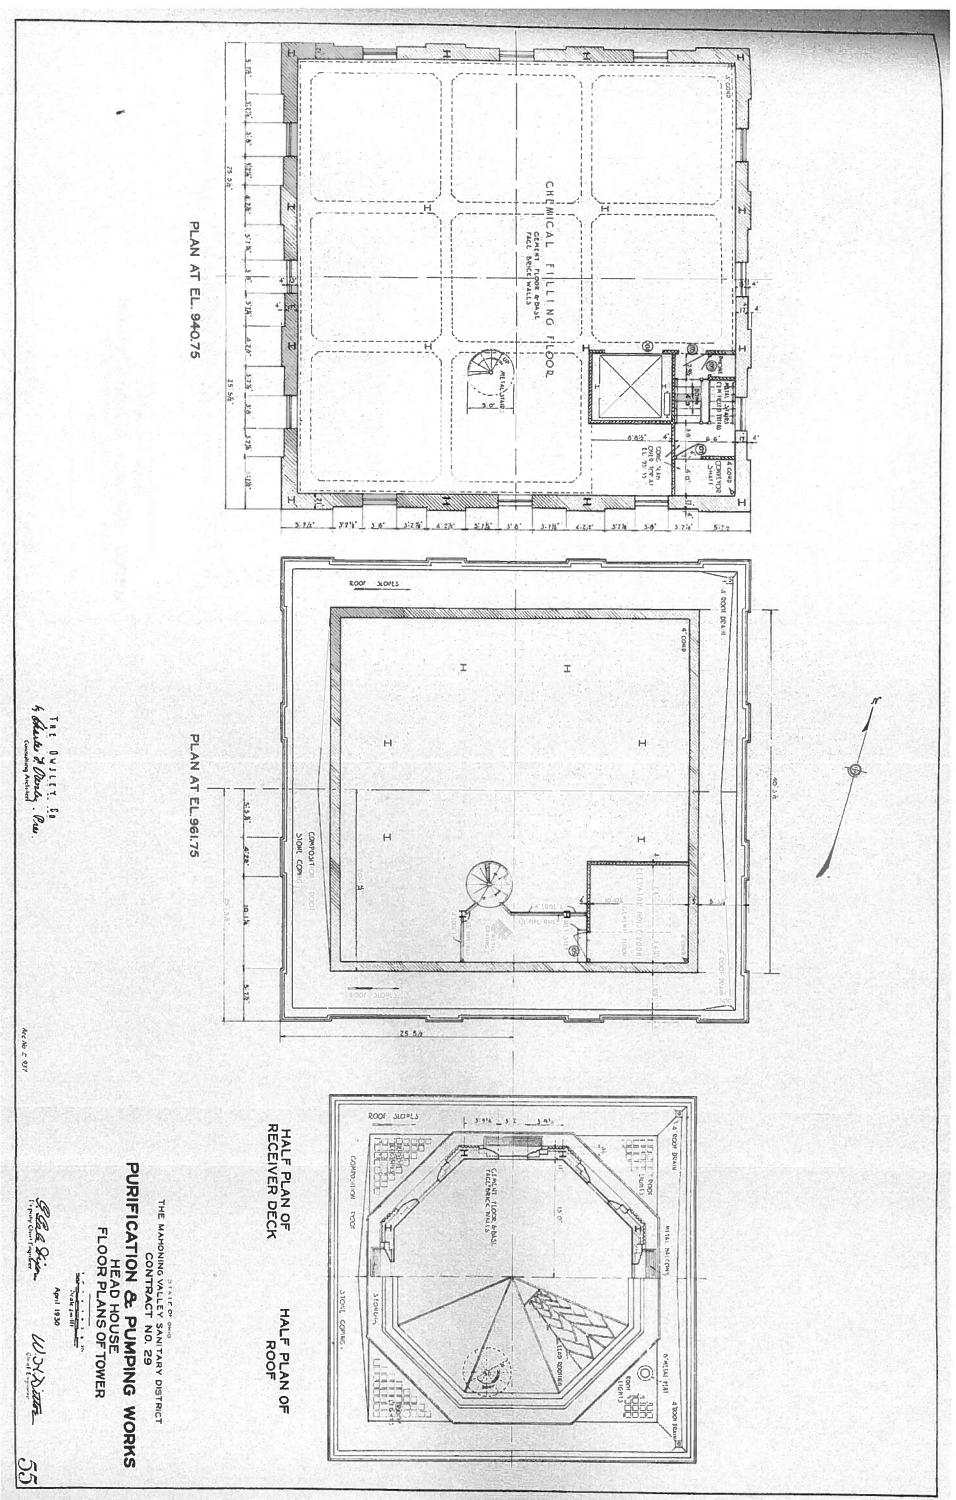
Dwg. 55 - Head House - Floor Plans of Tower.tif
